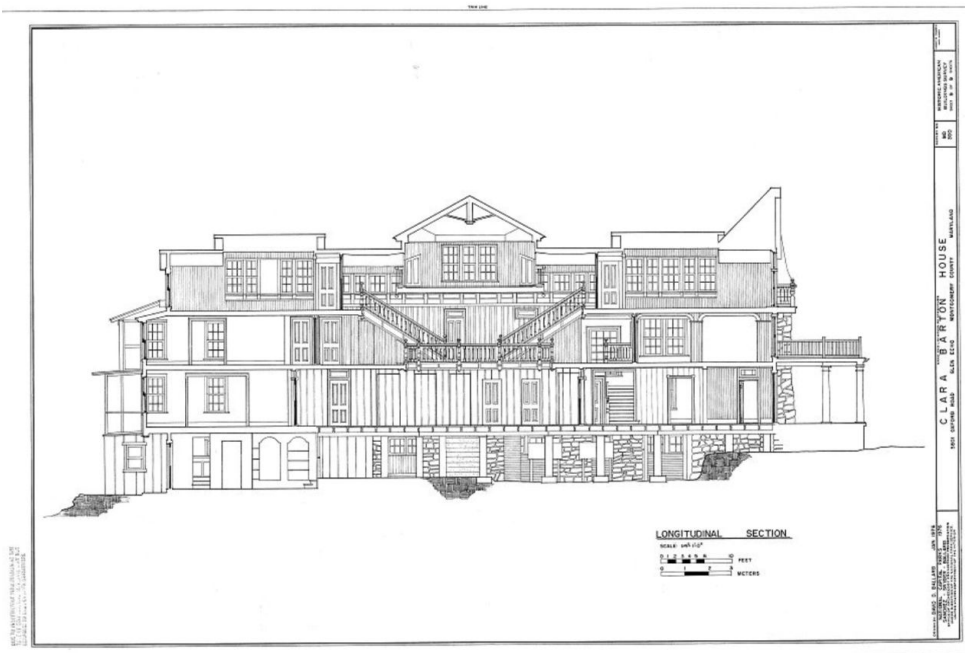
Sectional drawing of Clara Barton Home from HABS (Historic American Building Survey, n.d.).
